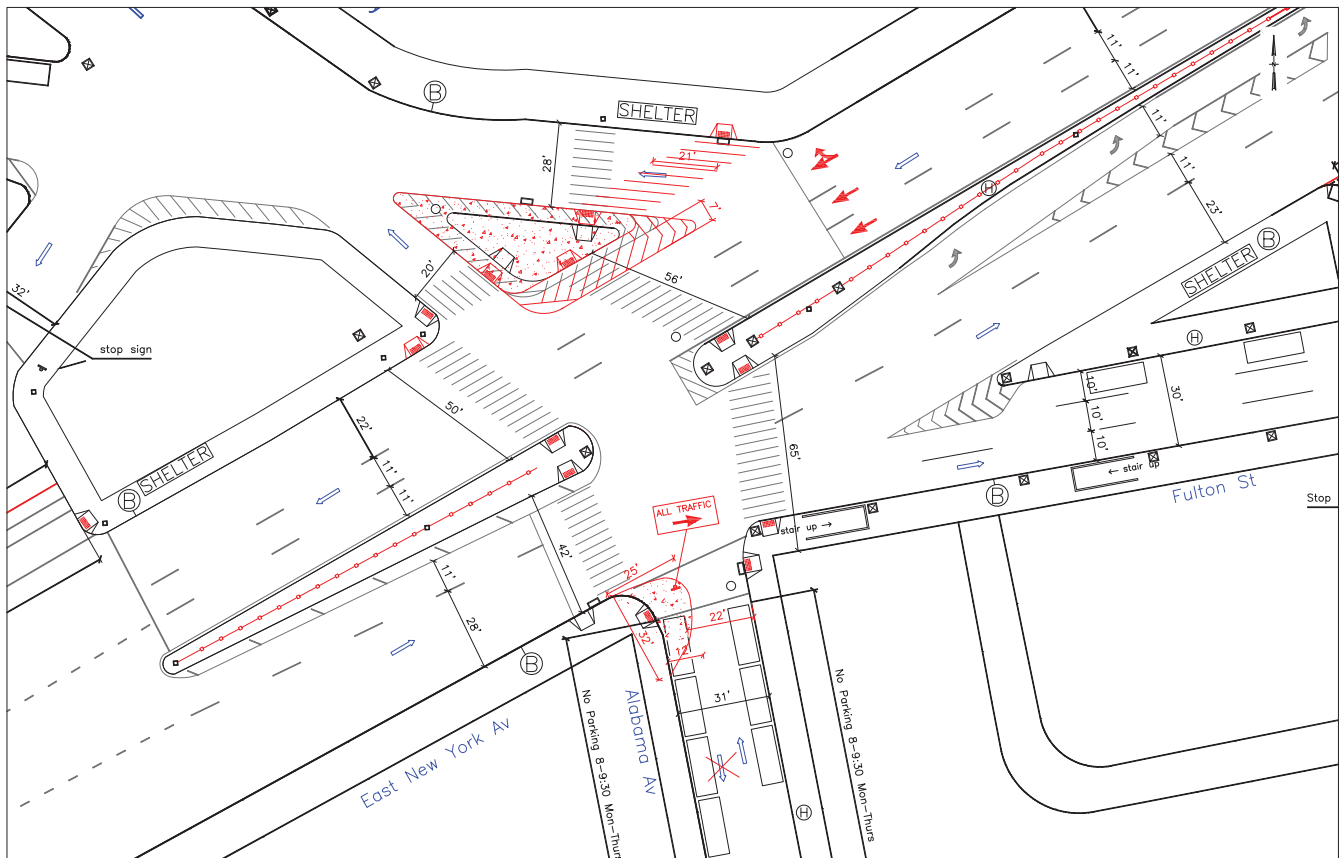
Jamaica/East New York Avenues & Alabama Avenue - Proposed
